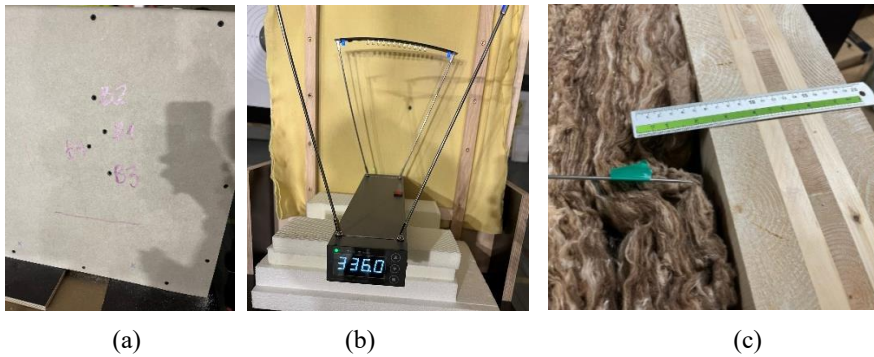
CLT wall specimens after the experiment (a–c)
